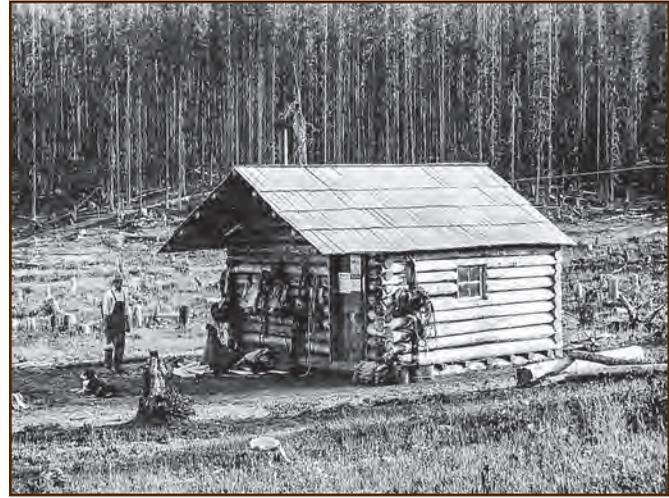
The log sleepers that support the Clearwater Springs Ranger Station cabin are clearly visible under the log floor joists in this photo. The builders constructed the cabin in 1913 and used it as a summer station in the Blue Mountains (Pomeroy Ranger District, Umatilla National Forest, Pacific Northwest Region).
